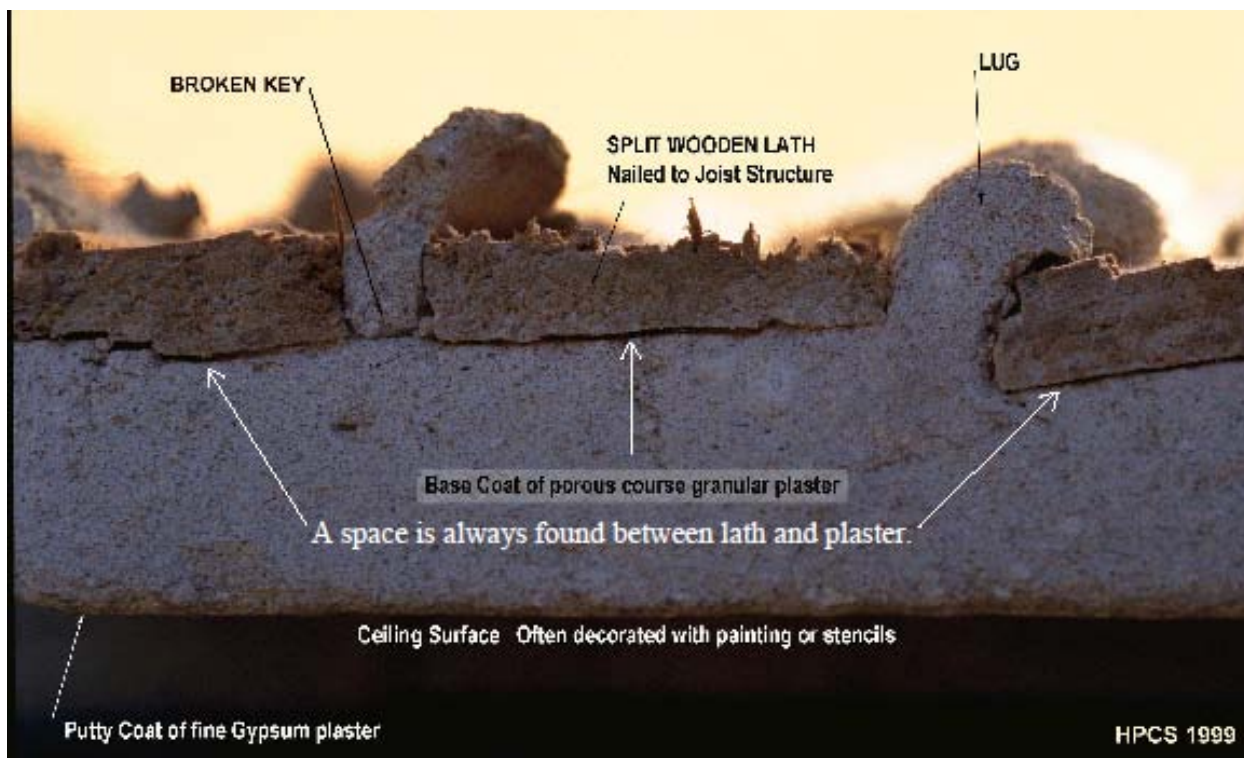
Typical Cross-section of a Wood Lath and Plaster Ceiling
